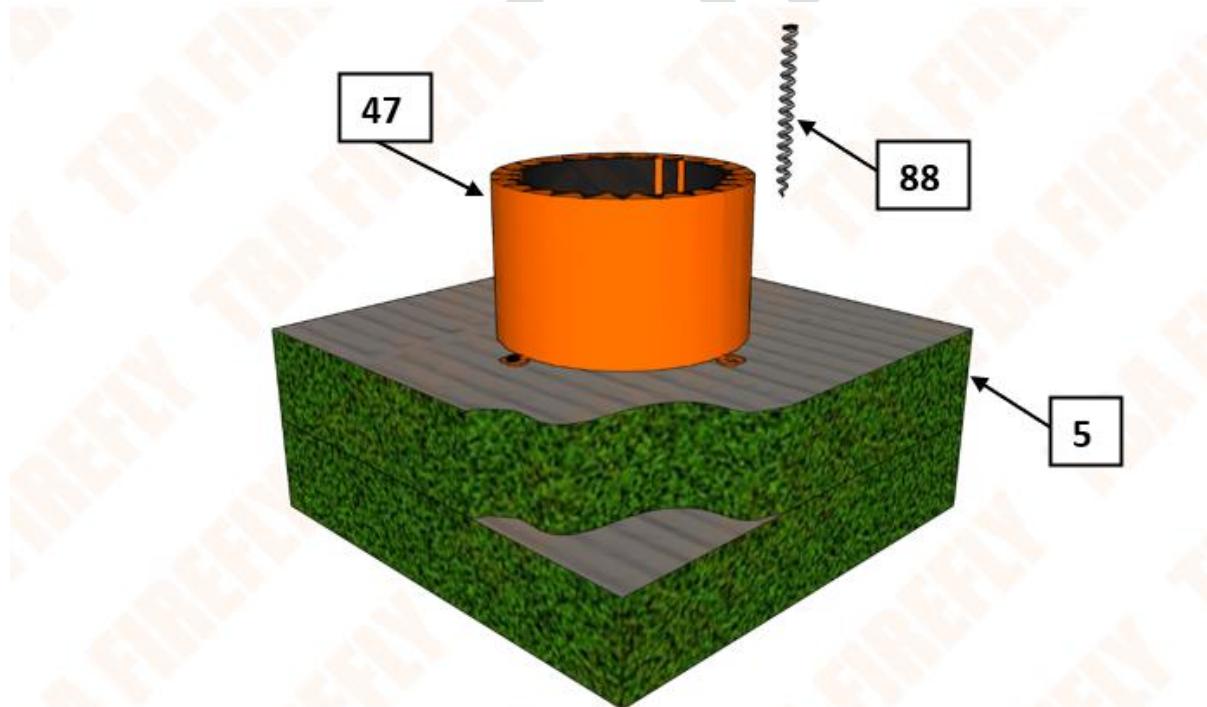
TBA Firefly™ FRF Fire Collar to both sides of the Double TBA Firefly™ Intubatt Seal. Fixing Detail using Pigtail Screws
